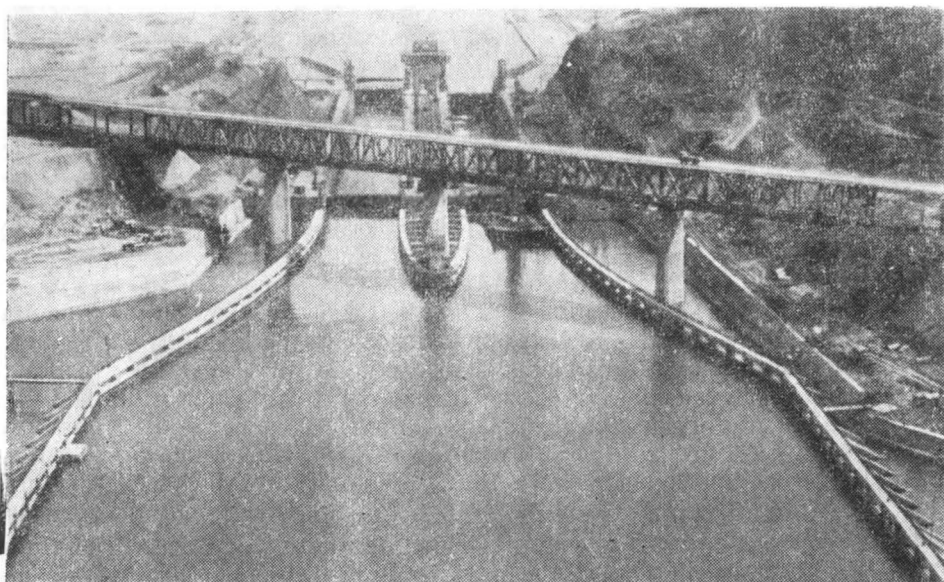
The Cernavoda lock and the superposed bridge (roadway and railroad)
